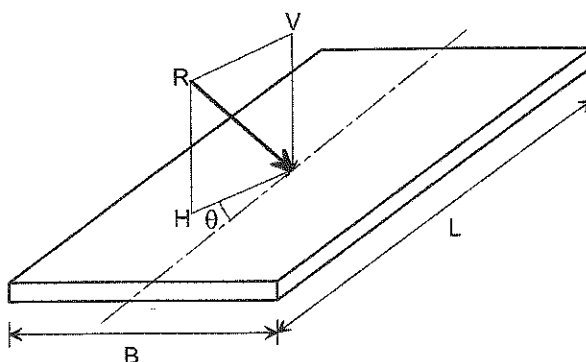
1—Inclined Loading Conventions
